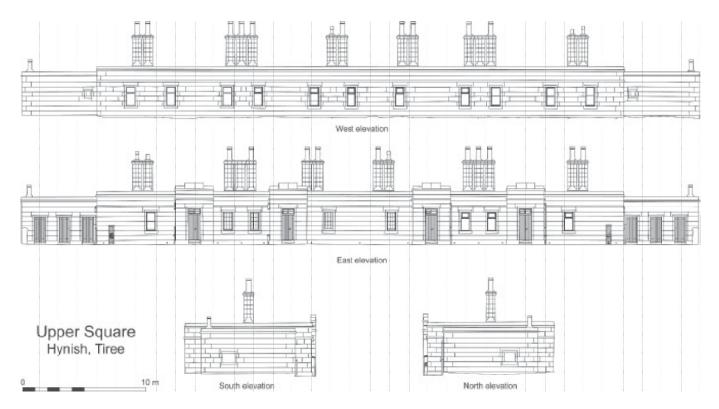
Upper Square, Hynish: external elevations of the buildings.
